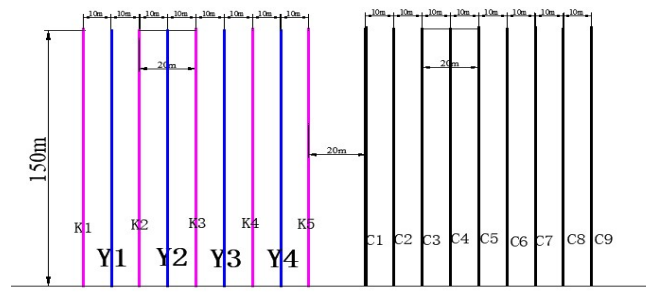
Layout of Fracturing Holes, Inspection Holes, and Comparison Holes in Coal Mining Face
